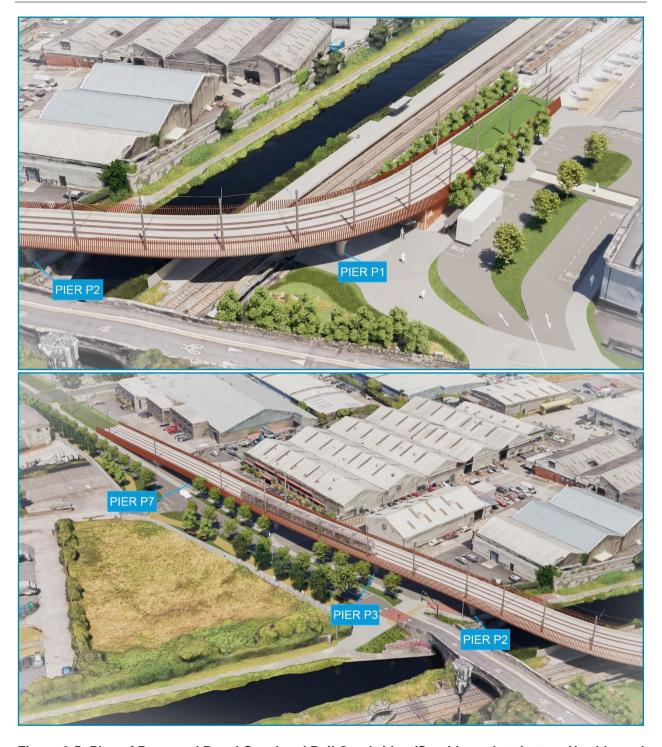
Plan of Proposed Royal Canal and Rail Overbridge (Southbound at the top; Northbound at the bottom) (15 years post-construction date)
